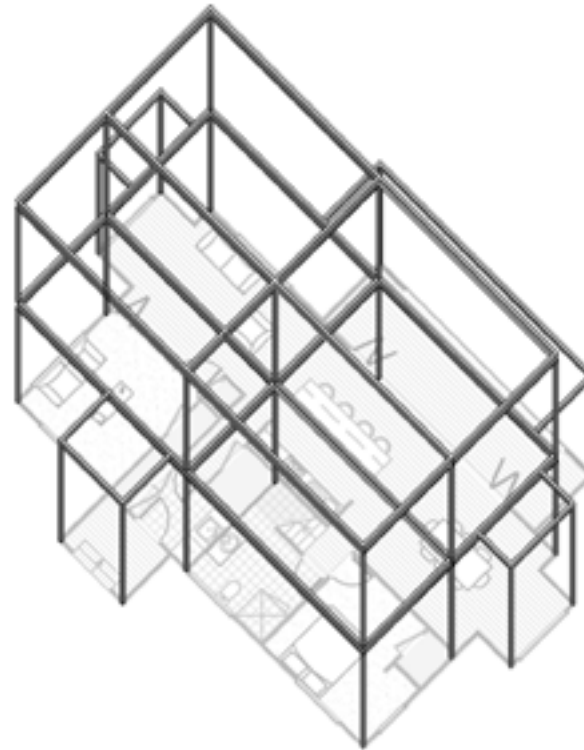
The Large design version with structural beam and column frame. The frame can be designed to take additional storeys and allows all walls to be non-loadbearing.
